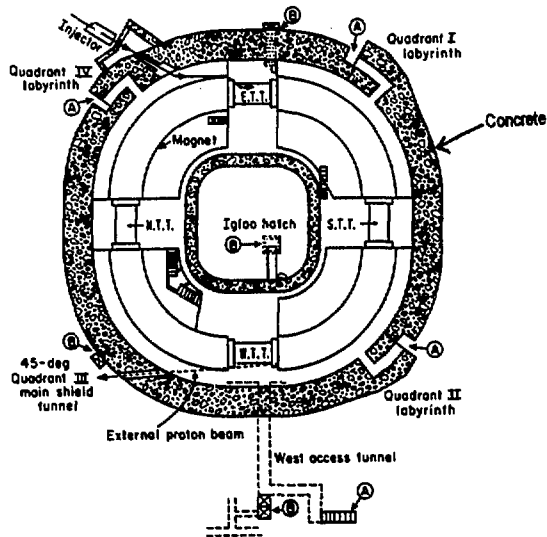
Plan view of the original Bevatron 6.2 GeV proton accelerator facility.
